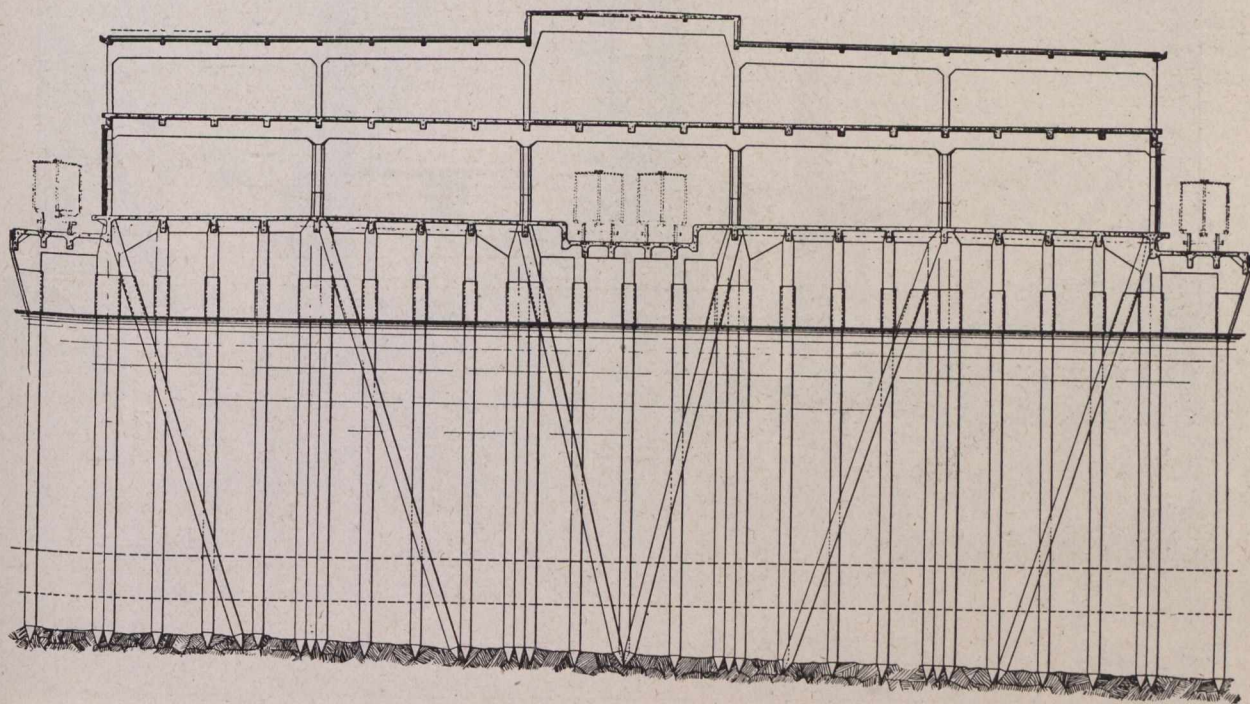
Transverse Half-Section of Pier, Showing Arrangement of Brace Piles.
